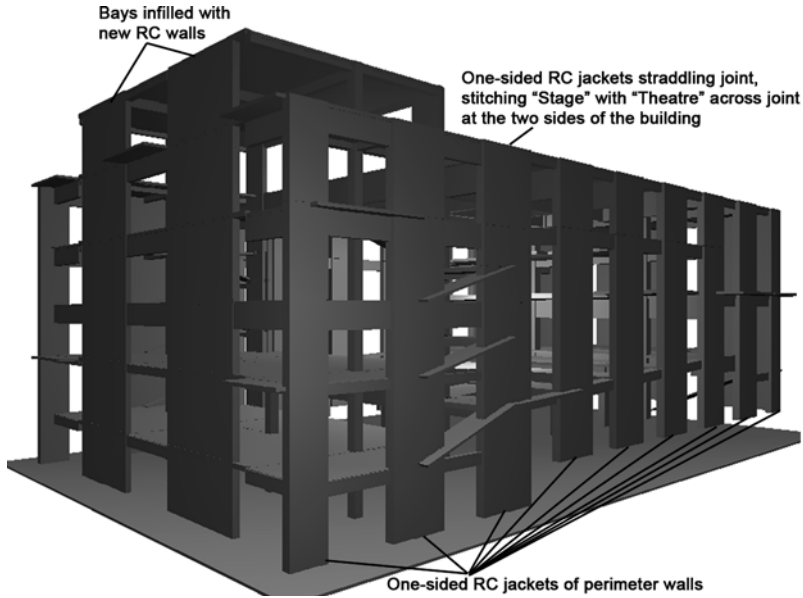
Schematic of RC jackets and new walls in theatre building
